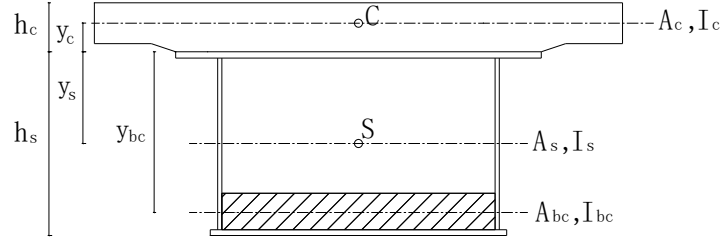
Definition of cross-sectional parameters of double composite section before concrete cracking
